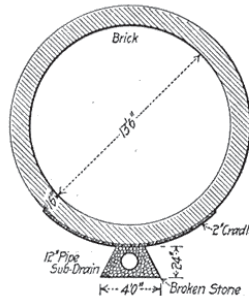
Section of Sewer Masonry in Subterranean Tunnel, 60th St. Sewer Tunnel, Brooklyn, N. Y.
